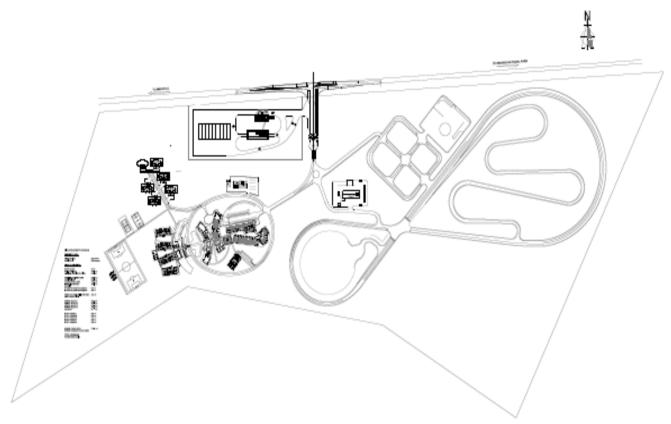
The Proposed Mkhuhlu Traffic Training Academy Site Layout Plan
